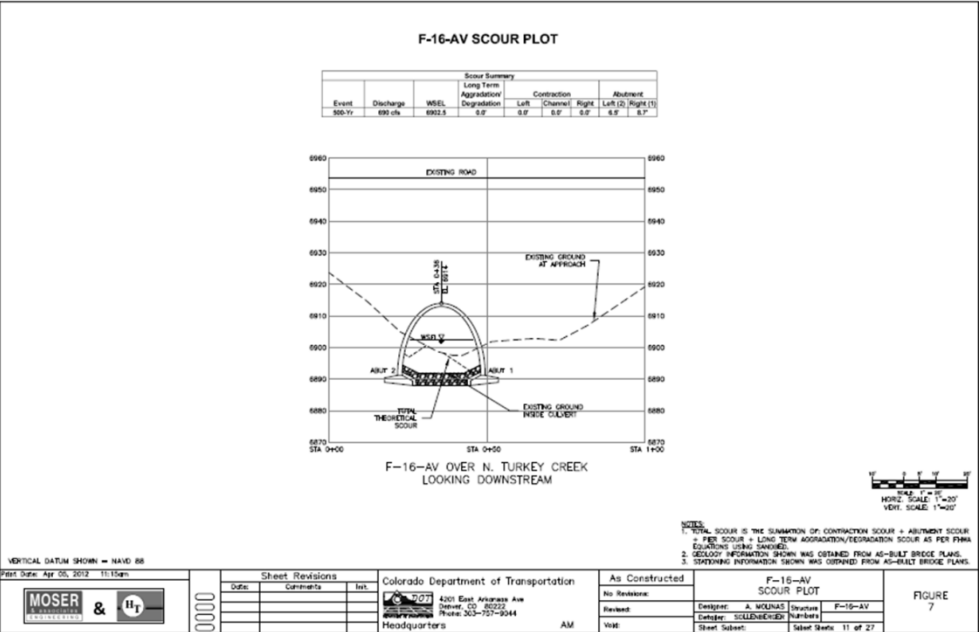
Scour plot generated in AutoCAD showing bridge geometry, foundation elevations, sediment boring hole results and theoretical scour
